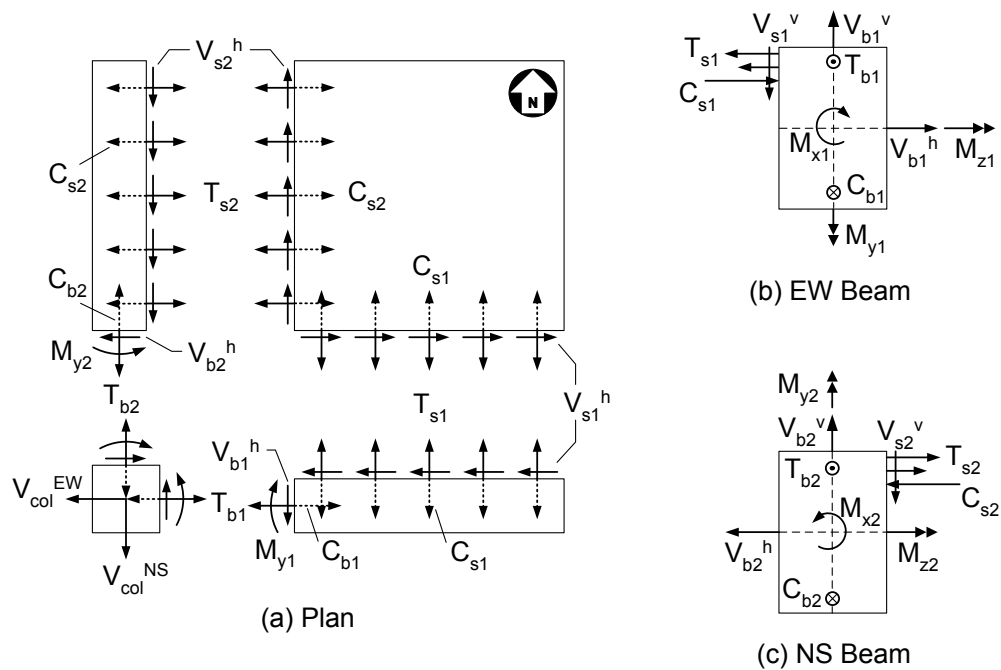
Force transfer mechanisms between slab, beams and joint during downward loading.
